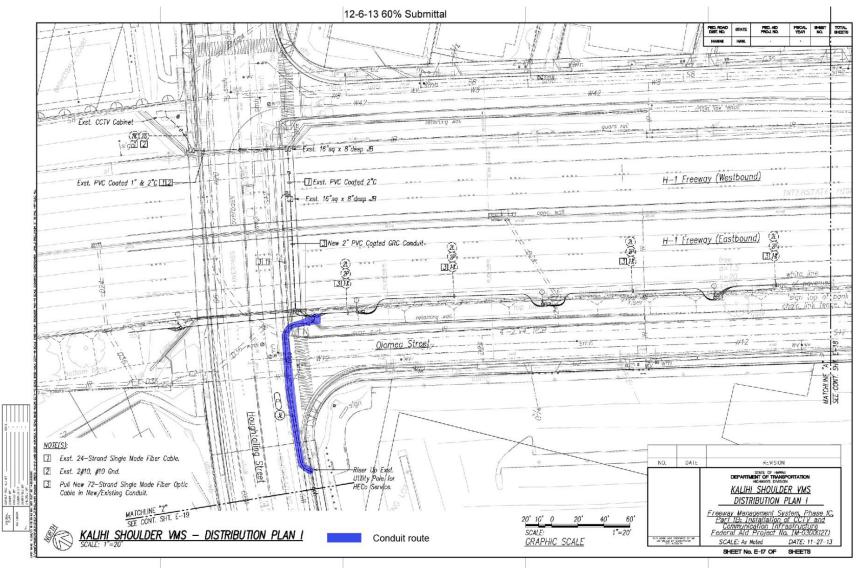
Design Plan for Electrical Connection to Support VMS.
